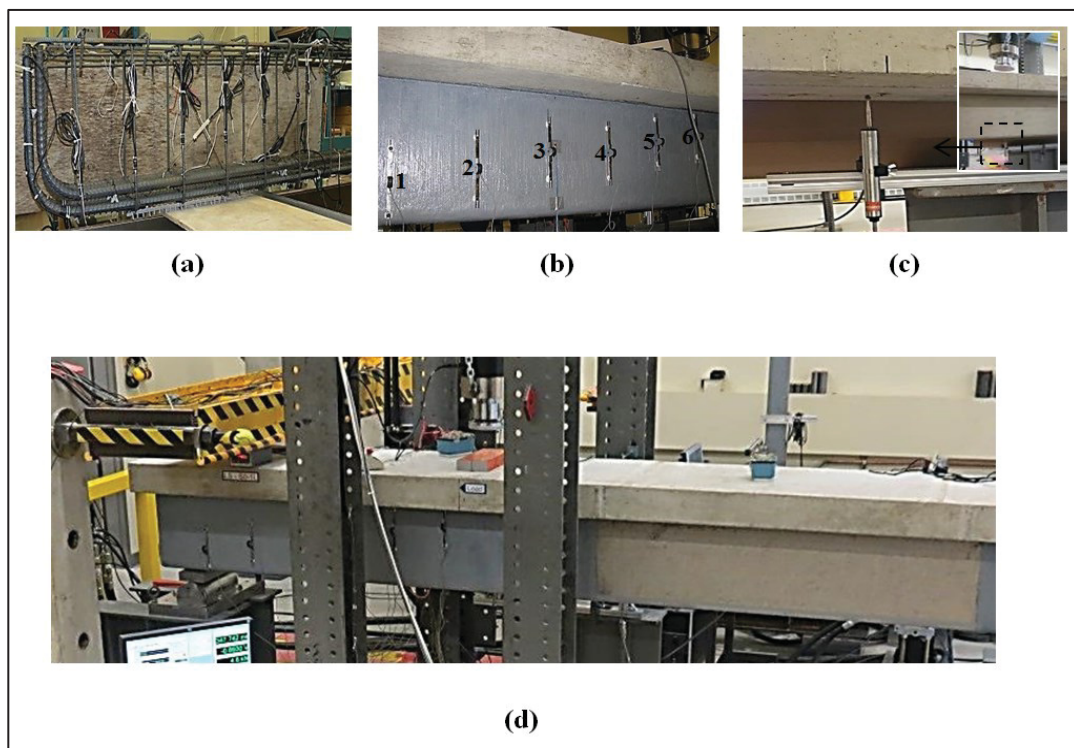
Typical instrumentation and test setup: (a) internal strain gauges; (b) external crack gauges; (c) LVDTs location; and (d) test setup
